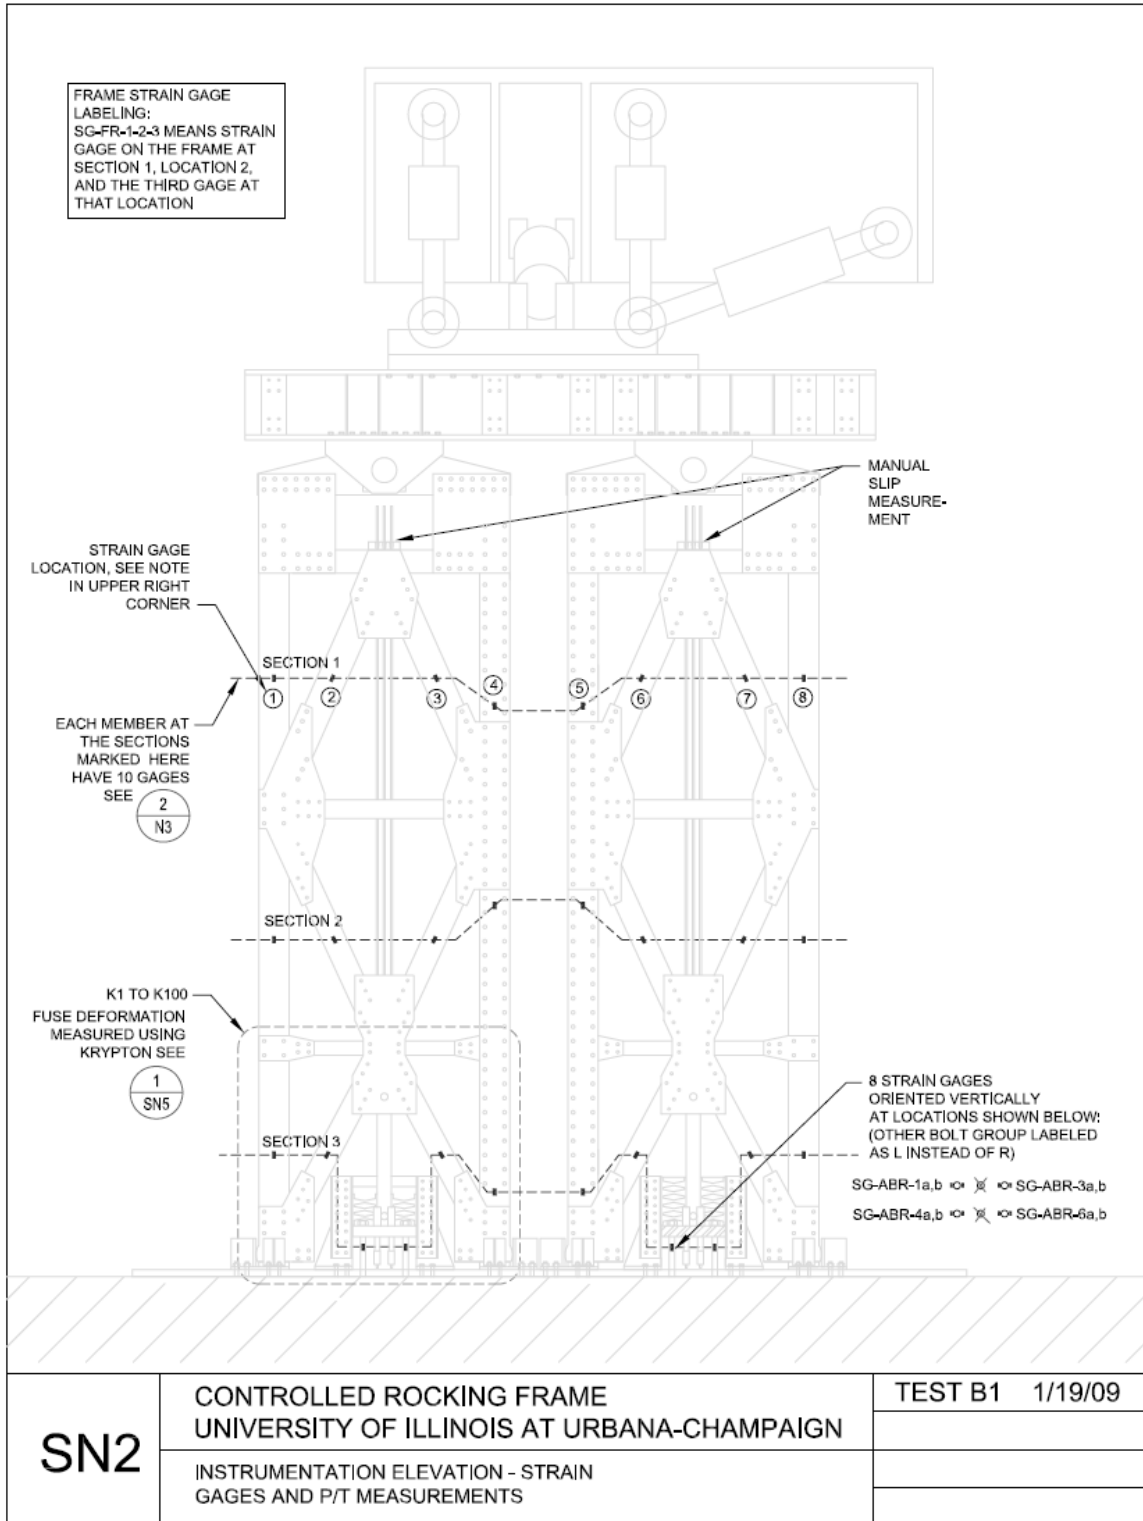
Single Frame Configuration Instrumentation Plan – Strain Gages
